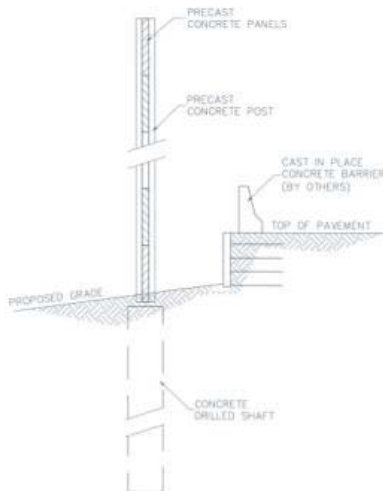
The original plan required as much as 4 feet between the retaining and sound walls.
